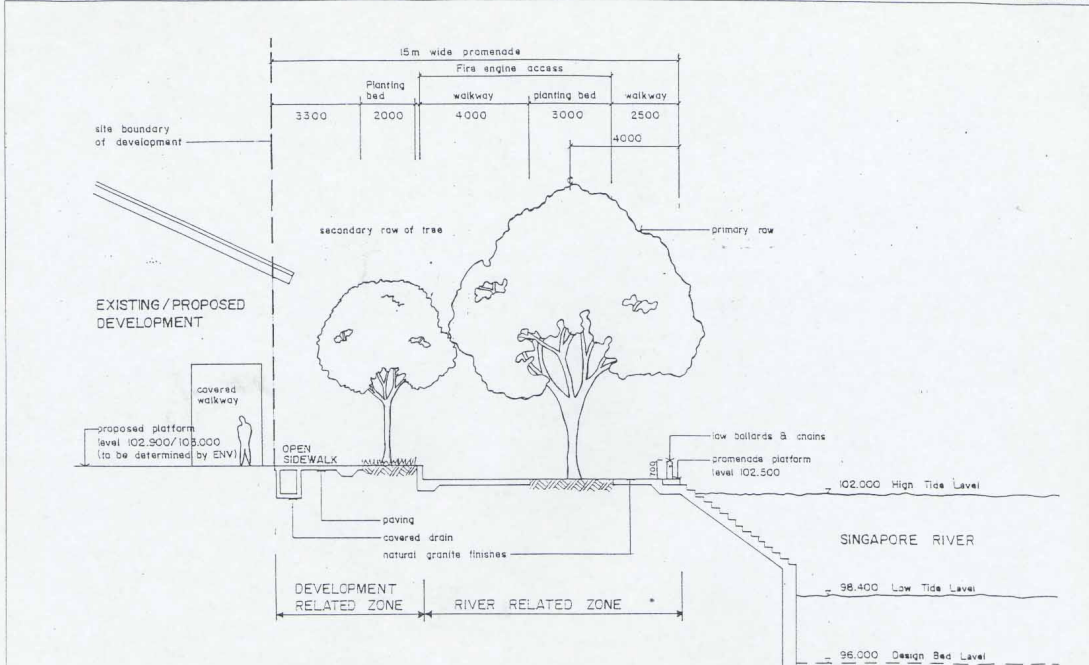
DETAILS OF TYPE 'C' RIVERWALL	DRAWING TITLE SINGAPORE RIVER ENVIRONMENTAL DESIGN MASTER PLAN	SCALE NOT TO SCALE	PROJECT SERVICES DIVISION URBAN REDEVELOPMENT AUTHORITY URA BUILDING 16 RAFFLES ROAD SINGAPORE 06A
